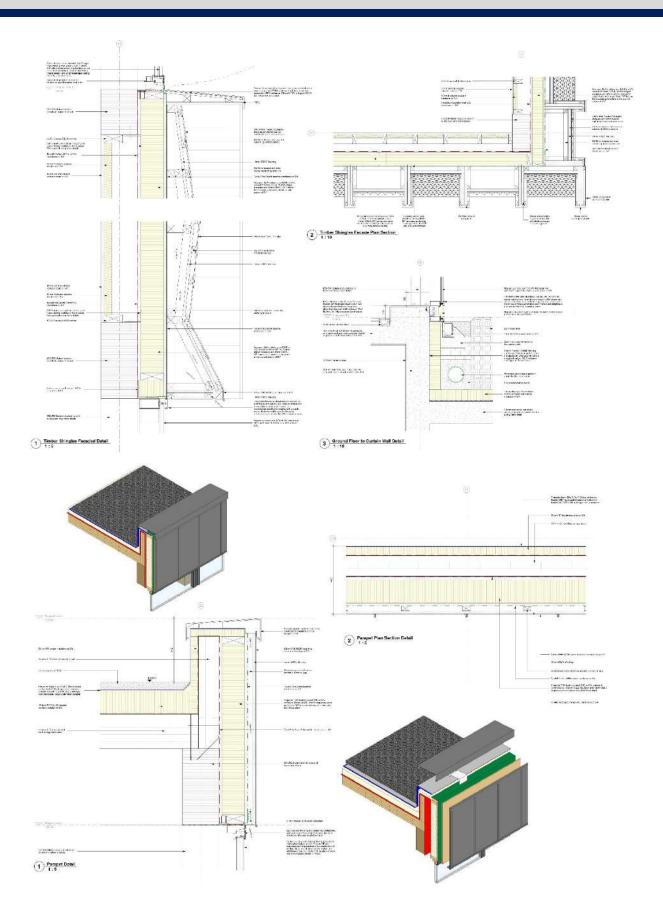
External Envelop & Parapet Details (2D/3D)
